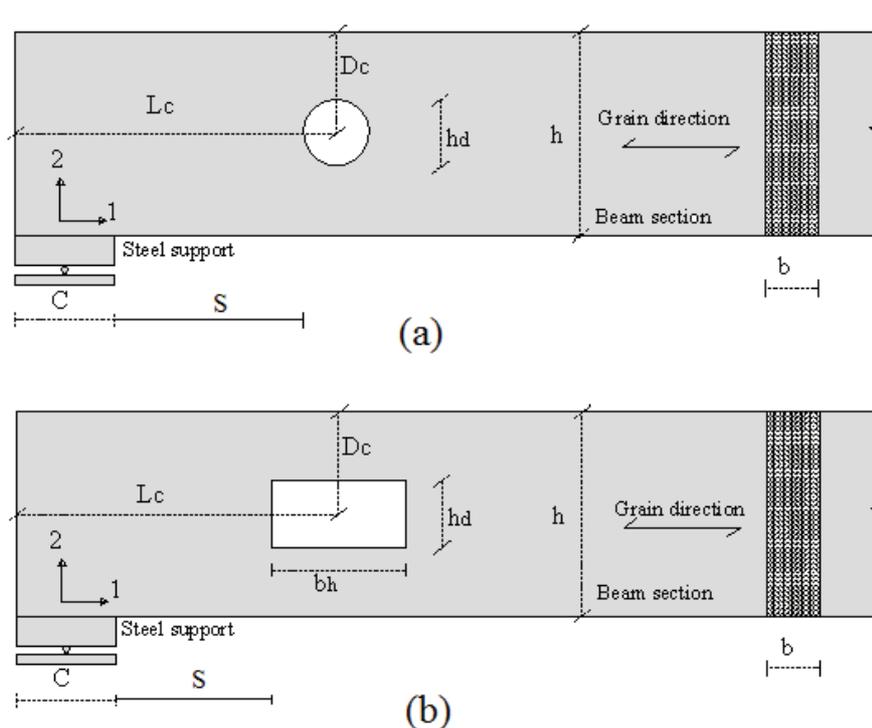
Drawings of beams with circular (a) and rectangular (b) holes.
